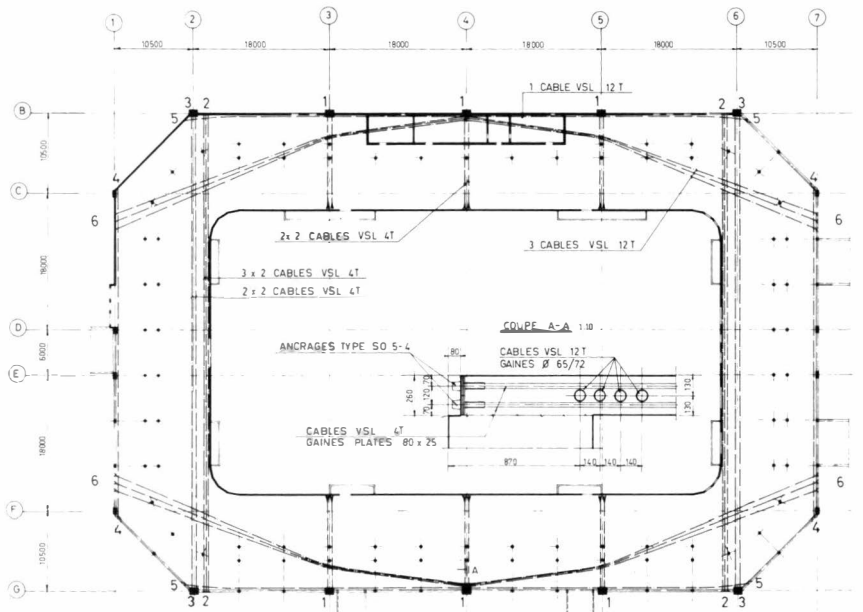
1st level slab. Disposition of the prestressing cables – Dalle sur niveau 0. Schéma de la précontrainte – Decke über Niveau 0. Spannliederanordnung
